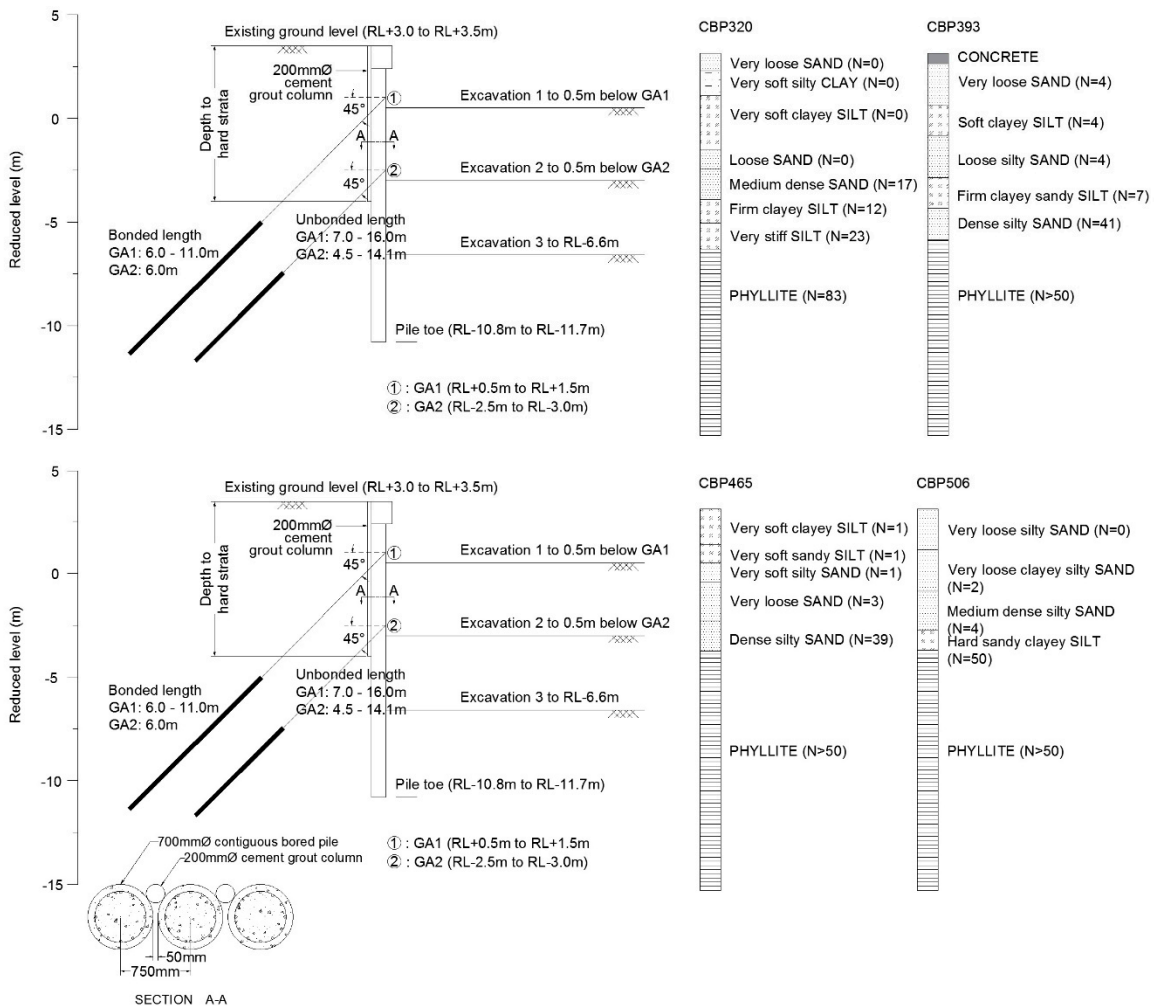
Cross section of contiguous bored pile (CBP) wall details and soil profiles for different wall sections.
